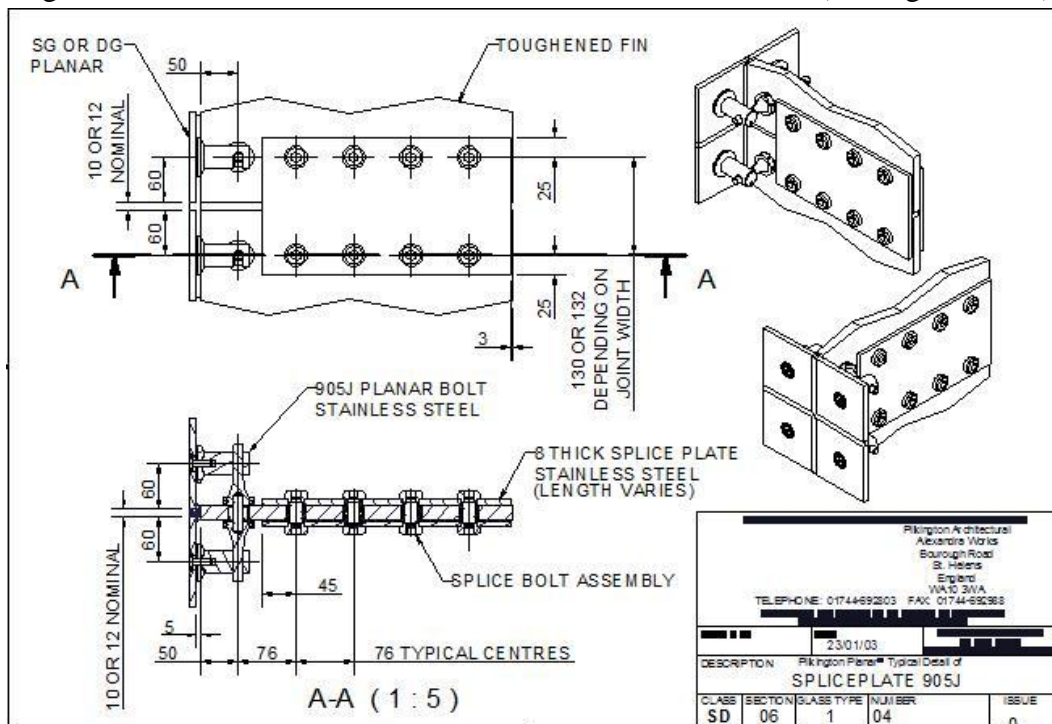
Splice Plate and 2-Point Connector to Glass for Curtain Wall Detail (Pilkington, 2009)
